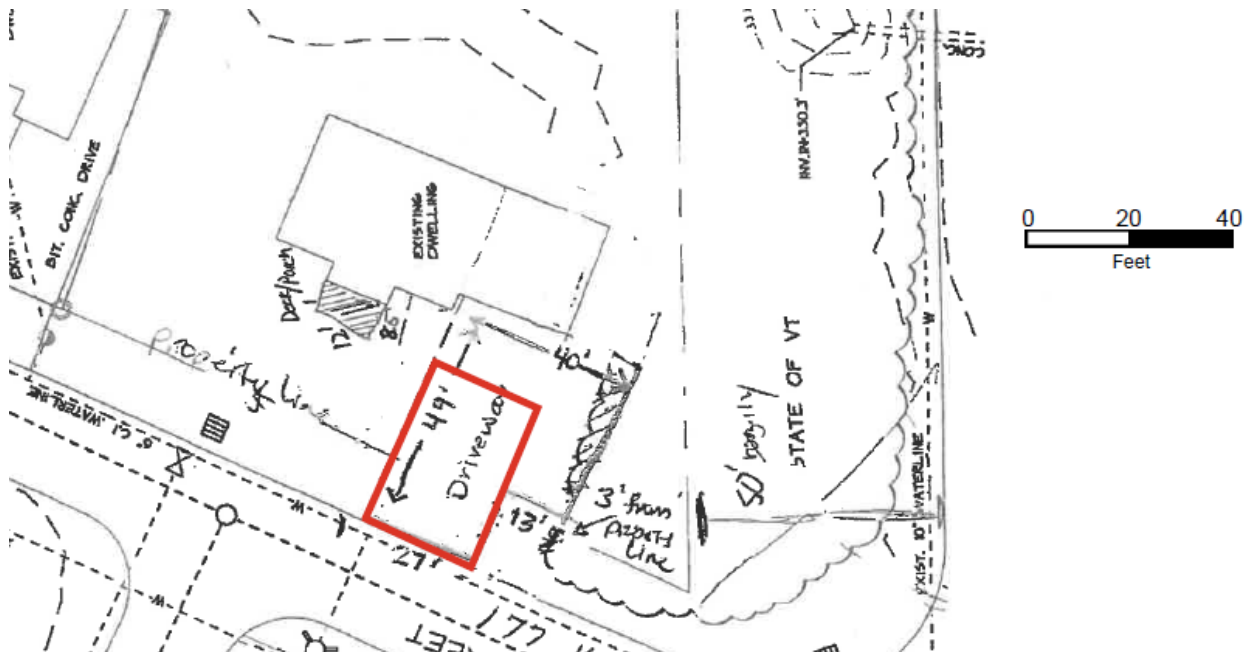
Site plan showing the portion of the driveway and apron that is required to be paved per Section 703.K.3.
